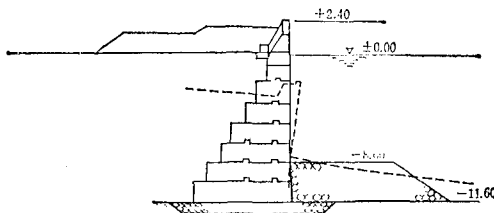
Cross Section of Quaywall in A Berth in Niigata Port
